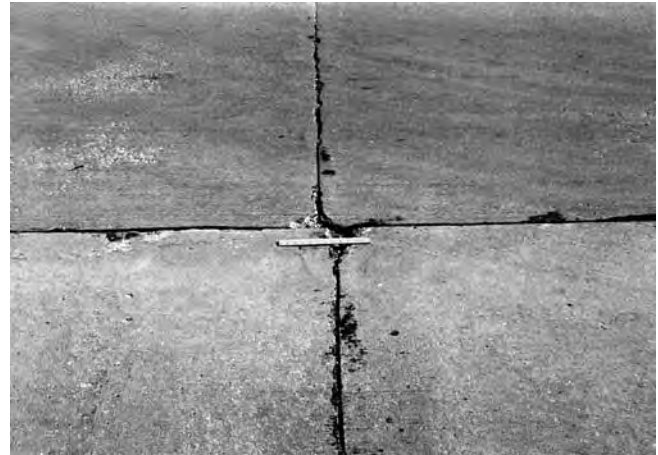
Low-Severity Spalling, Corner
